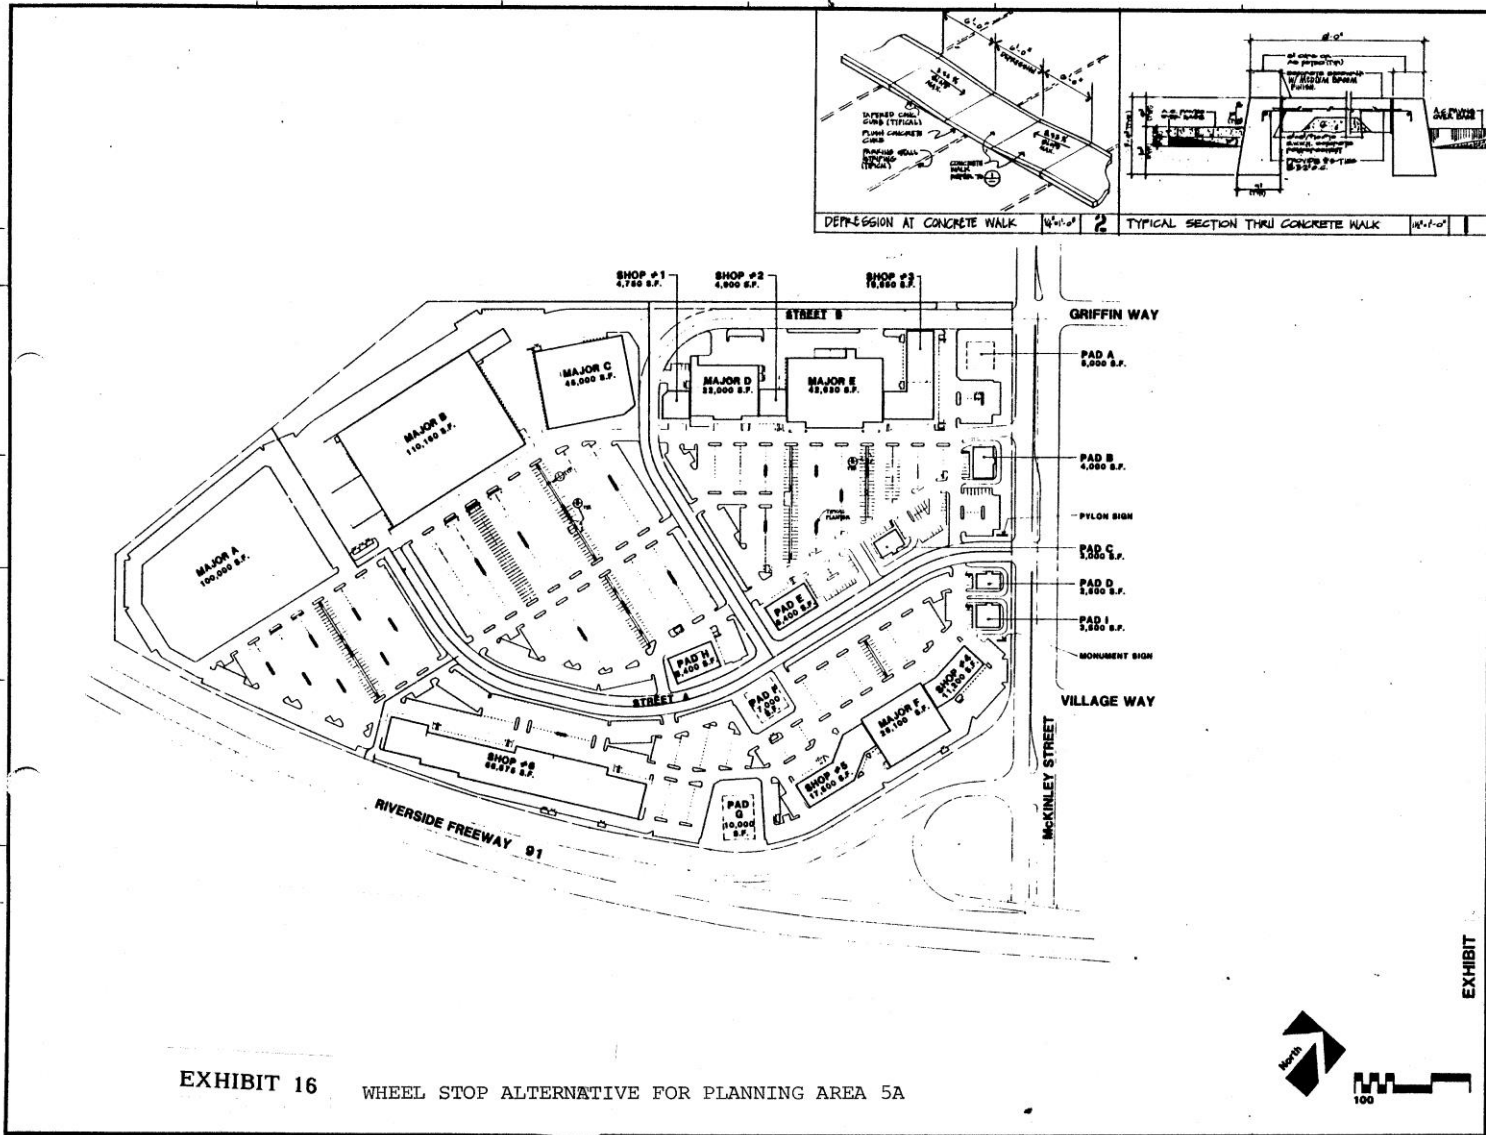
WHEEL STOP ALTERNATIVE FOR PLANNING AREA 5A
